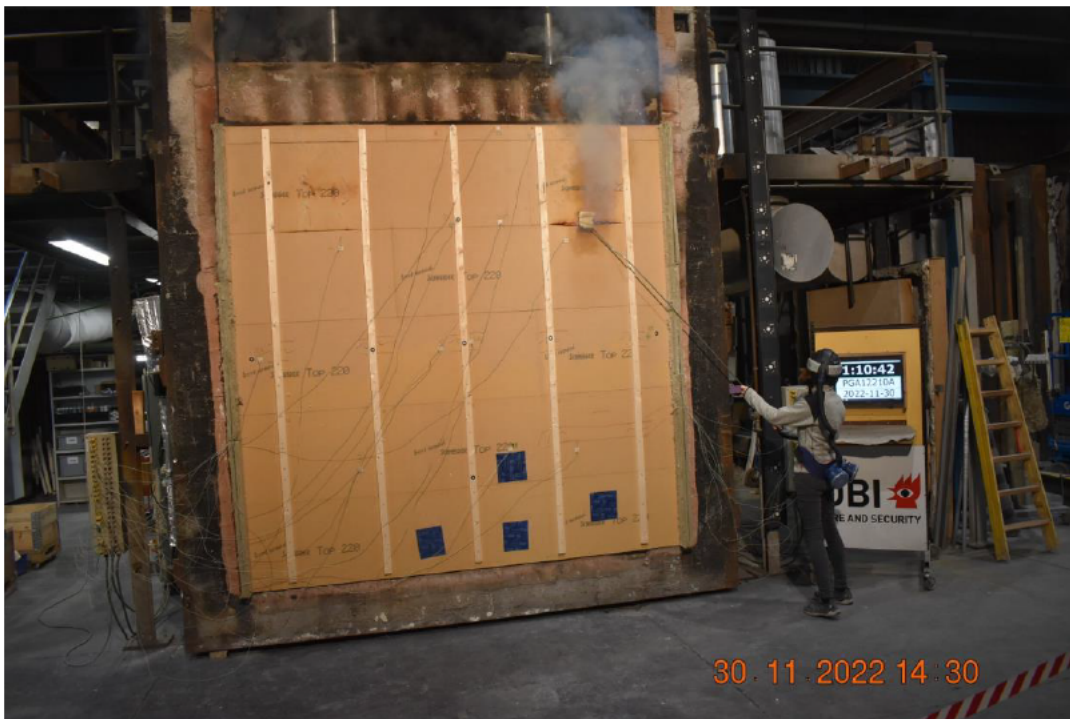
Test specimen seen from unexposed side 70 minutes into the test
